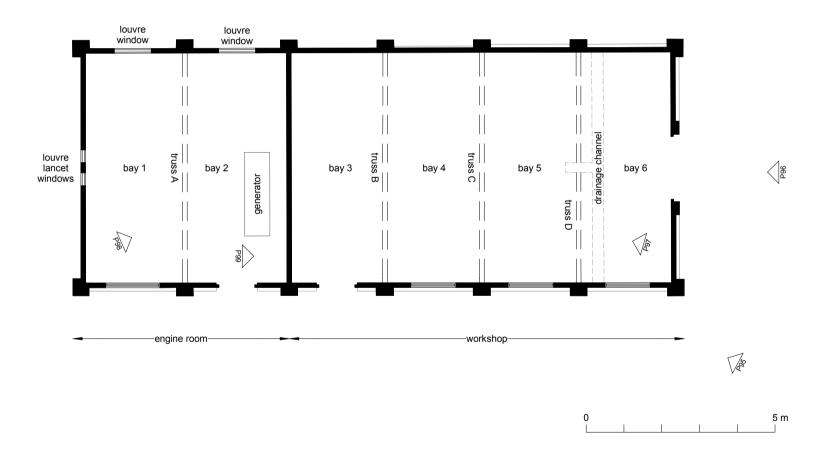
Plan of structure 15, 1911 engine house, showing the location and orientation of photographs included in this report.
